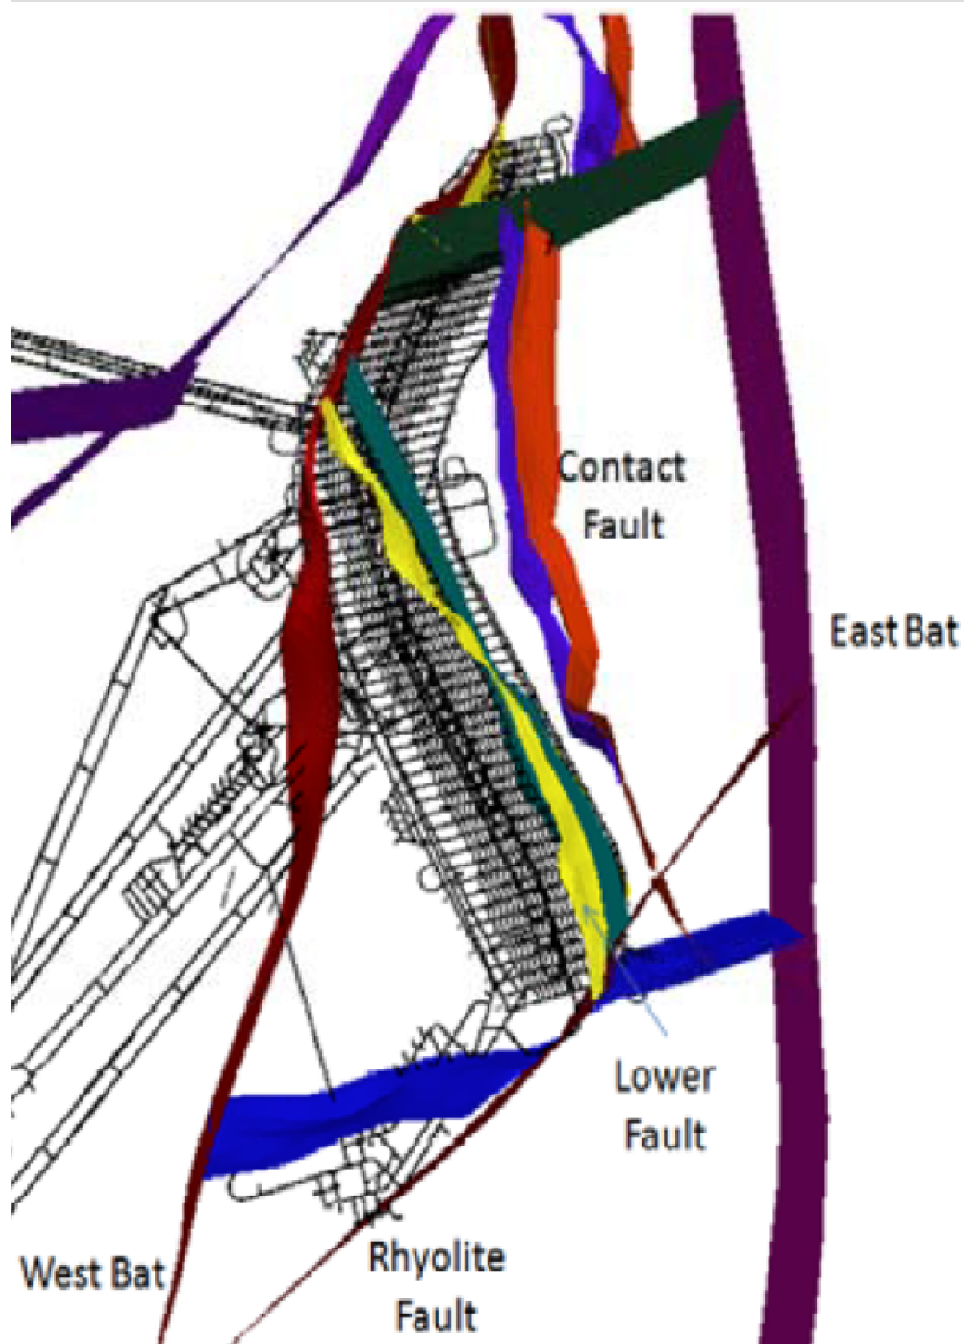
Plan of Interpreted Major Faults at the Footwall of the Cave, with the Planned Footprint and Infrastructure Development
